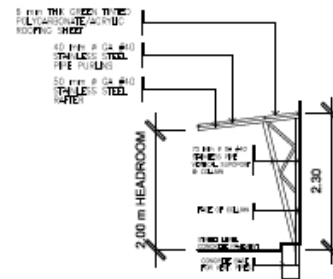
DETAILED PLAN CANTILEVER ROOF OVERHANG @ MOTORCYCLE PARKING AREA
